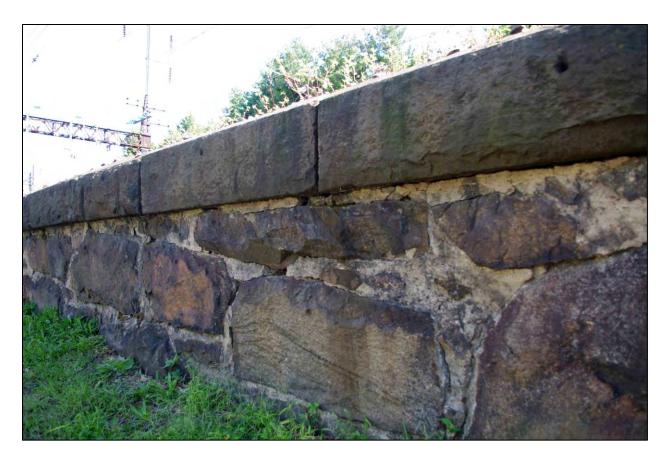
State-Level Documentation Photograph 23. Detail of masonry, retaining wall east of Fort Point Street Railroad Bridge, camera facing east (AHS photograph, 9/2017).
